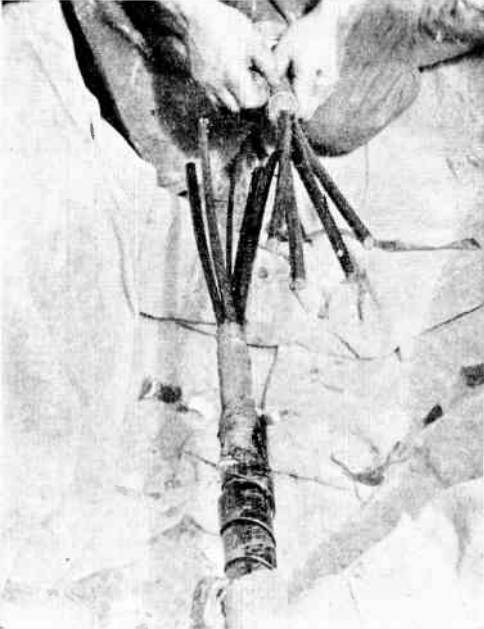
L.T. STRAIGHT-THROUGH CABLE JOINT—FIRST STAGE. Showing armouring and lead sheath cut back.
